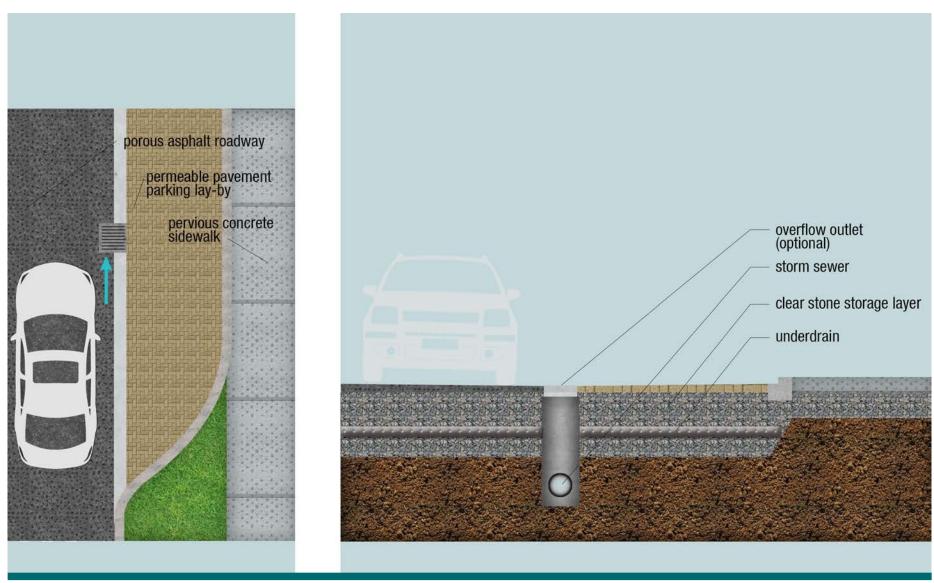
Permeable pavement plan view [left] and cross-section [right] showing porous asphalt roadway, permeable pavement lay-by and pervious concrete sidewalk
